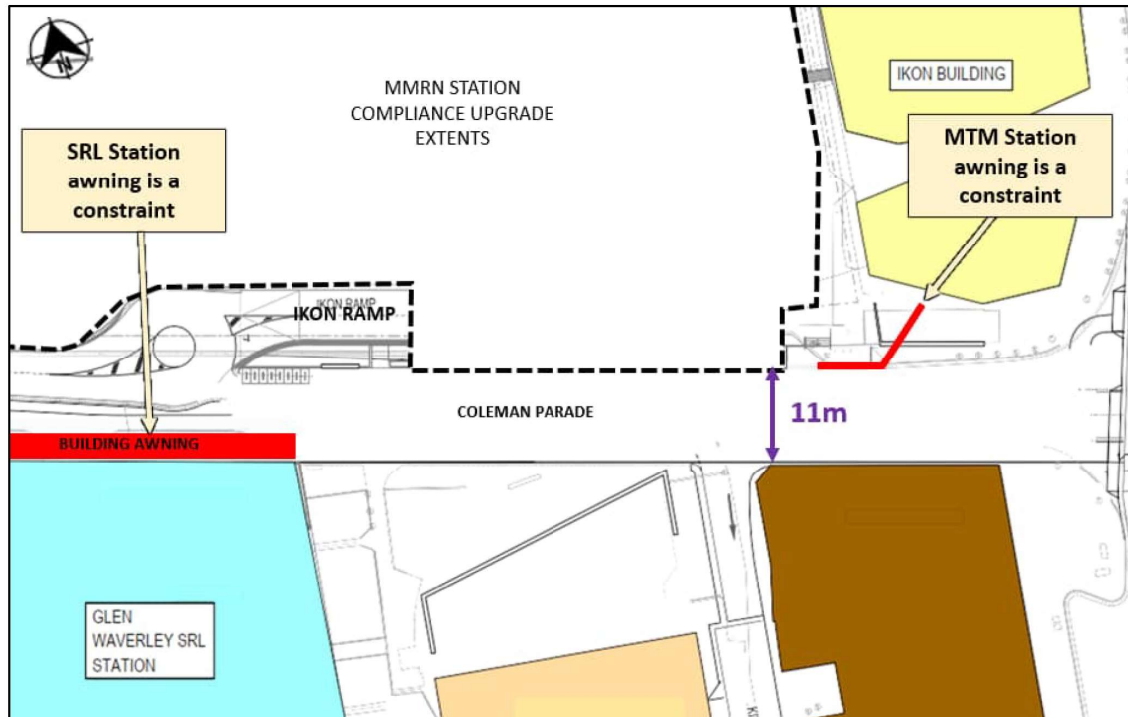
CROSS SECTION WIDTH CONSTRAINT DUE TO STATION BUILDING LOCATIONS
